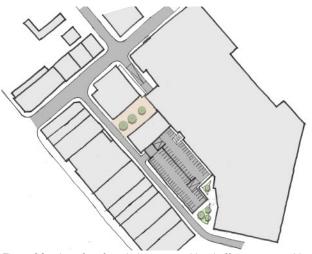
plan of preferred above ground level off street car parking locations in Precinct 6
